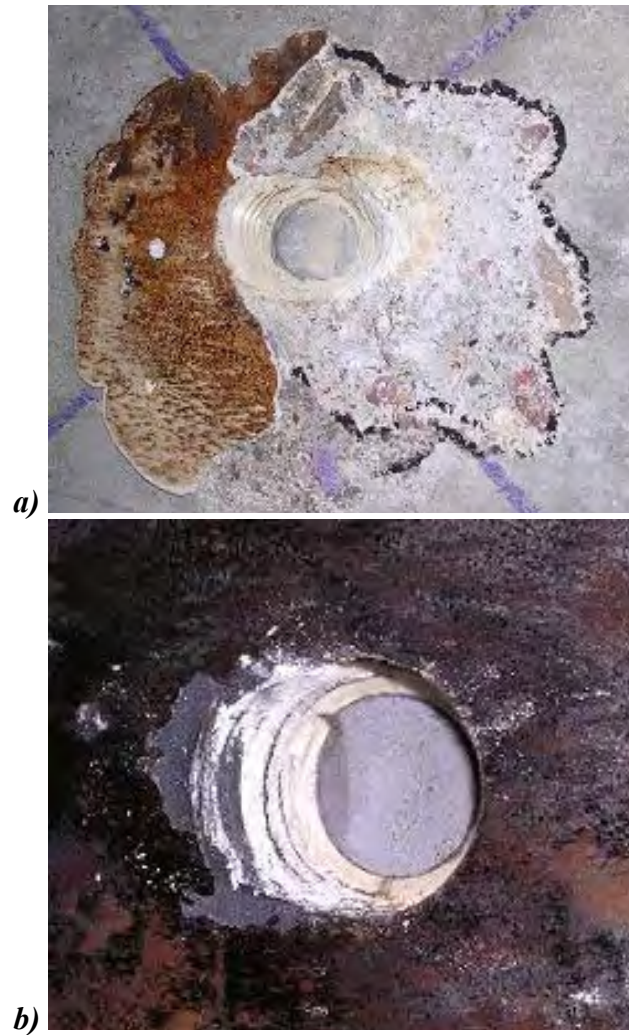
Failed Specimen HASAA-38HF: a) concrete block, b) steel plate
